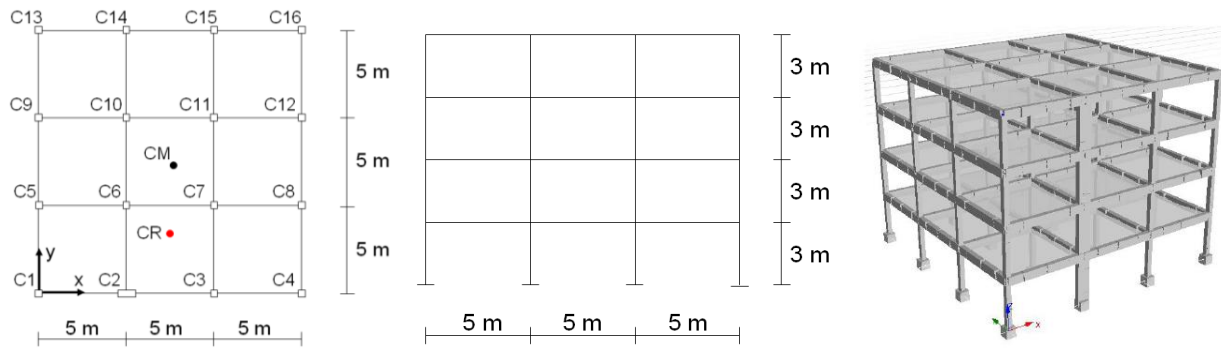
Schematic plan and elevation of the RC building under study and three-dimensional view of the developed numerical model.
